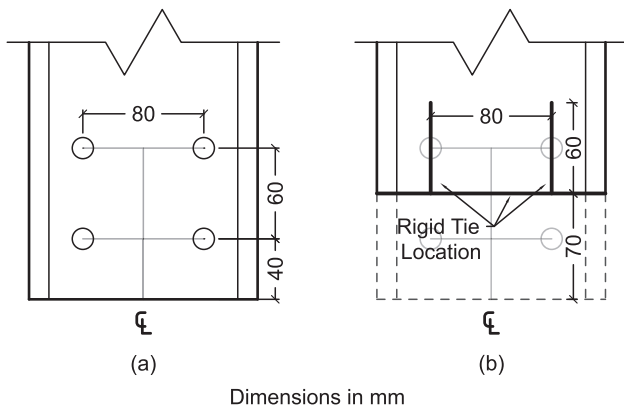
Dimensions of channel (a) end bolted connection and (b) rigid tie model.
